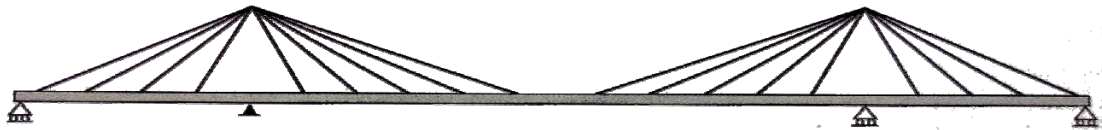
System B self anchored cable-stayed bridge having a continuous deck throughout its length
